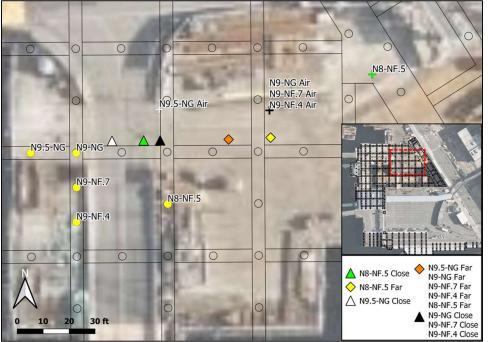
West Side of North Trestle Pile and Monitoring Locations
